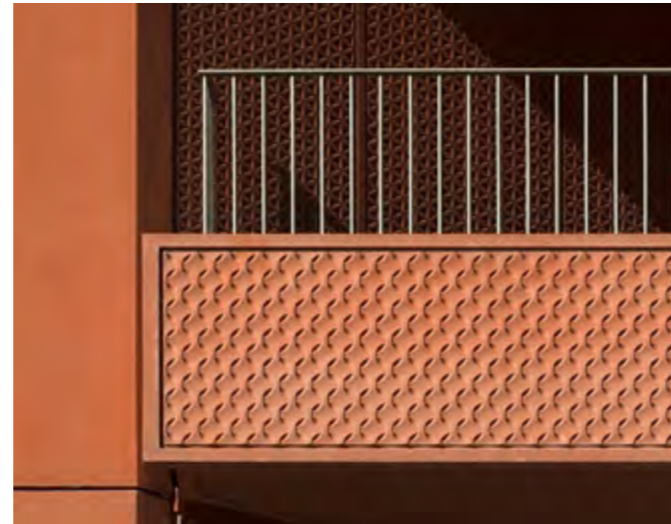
Plot 06 - Precedent example for the facade articulation & detailing
